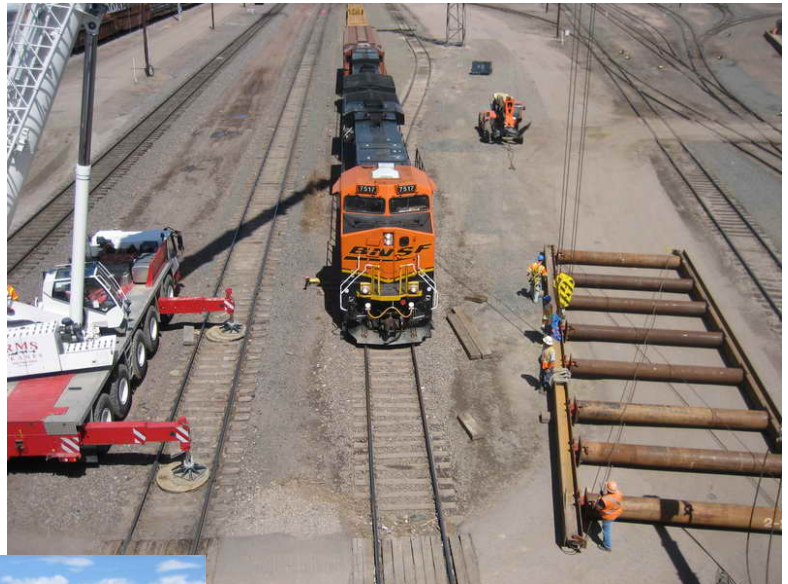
Pier Table 4 EB Falsework Construction – June 5, 2009:
